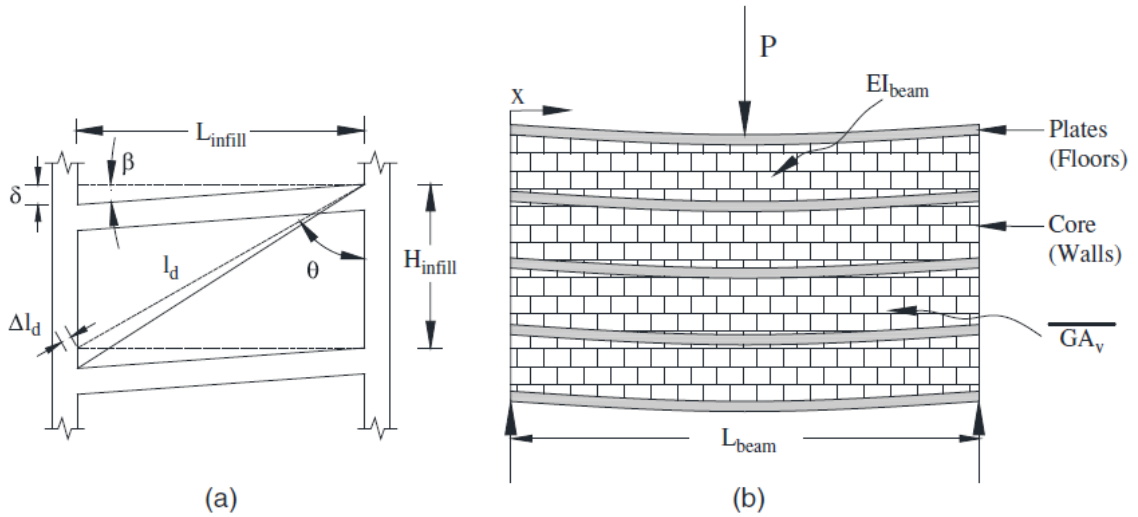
Damage quantification: (a) building frame and infill wall; and (b) laminate beam model
